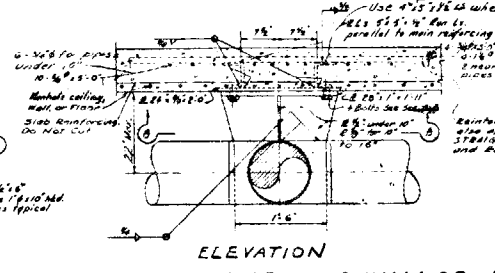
DETAIL OF SEWER PIPE SUPPORT & ANCHOR
